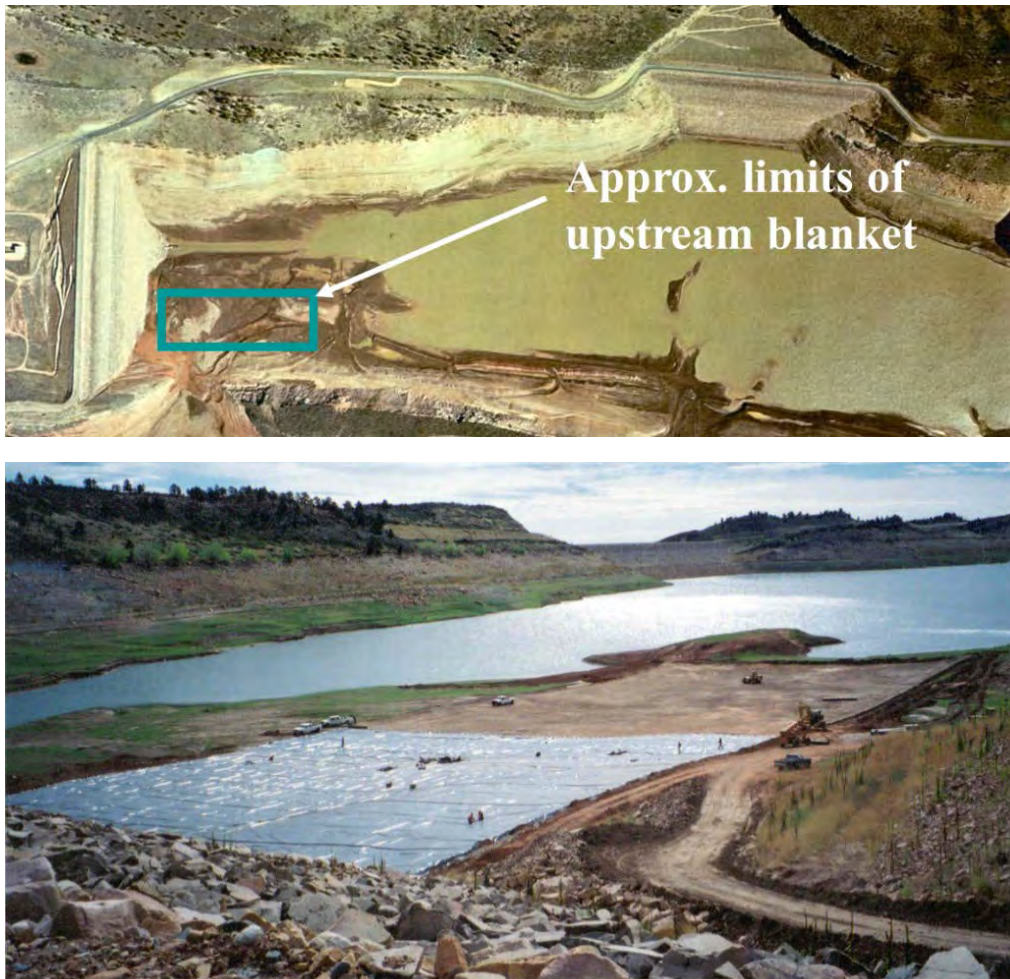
Upstream blanket constructed at Horsetooth Dam.
